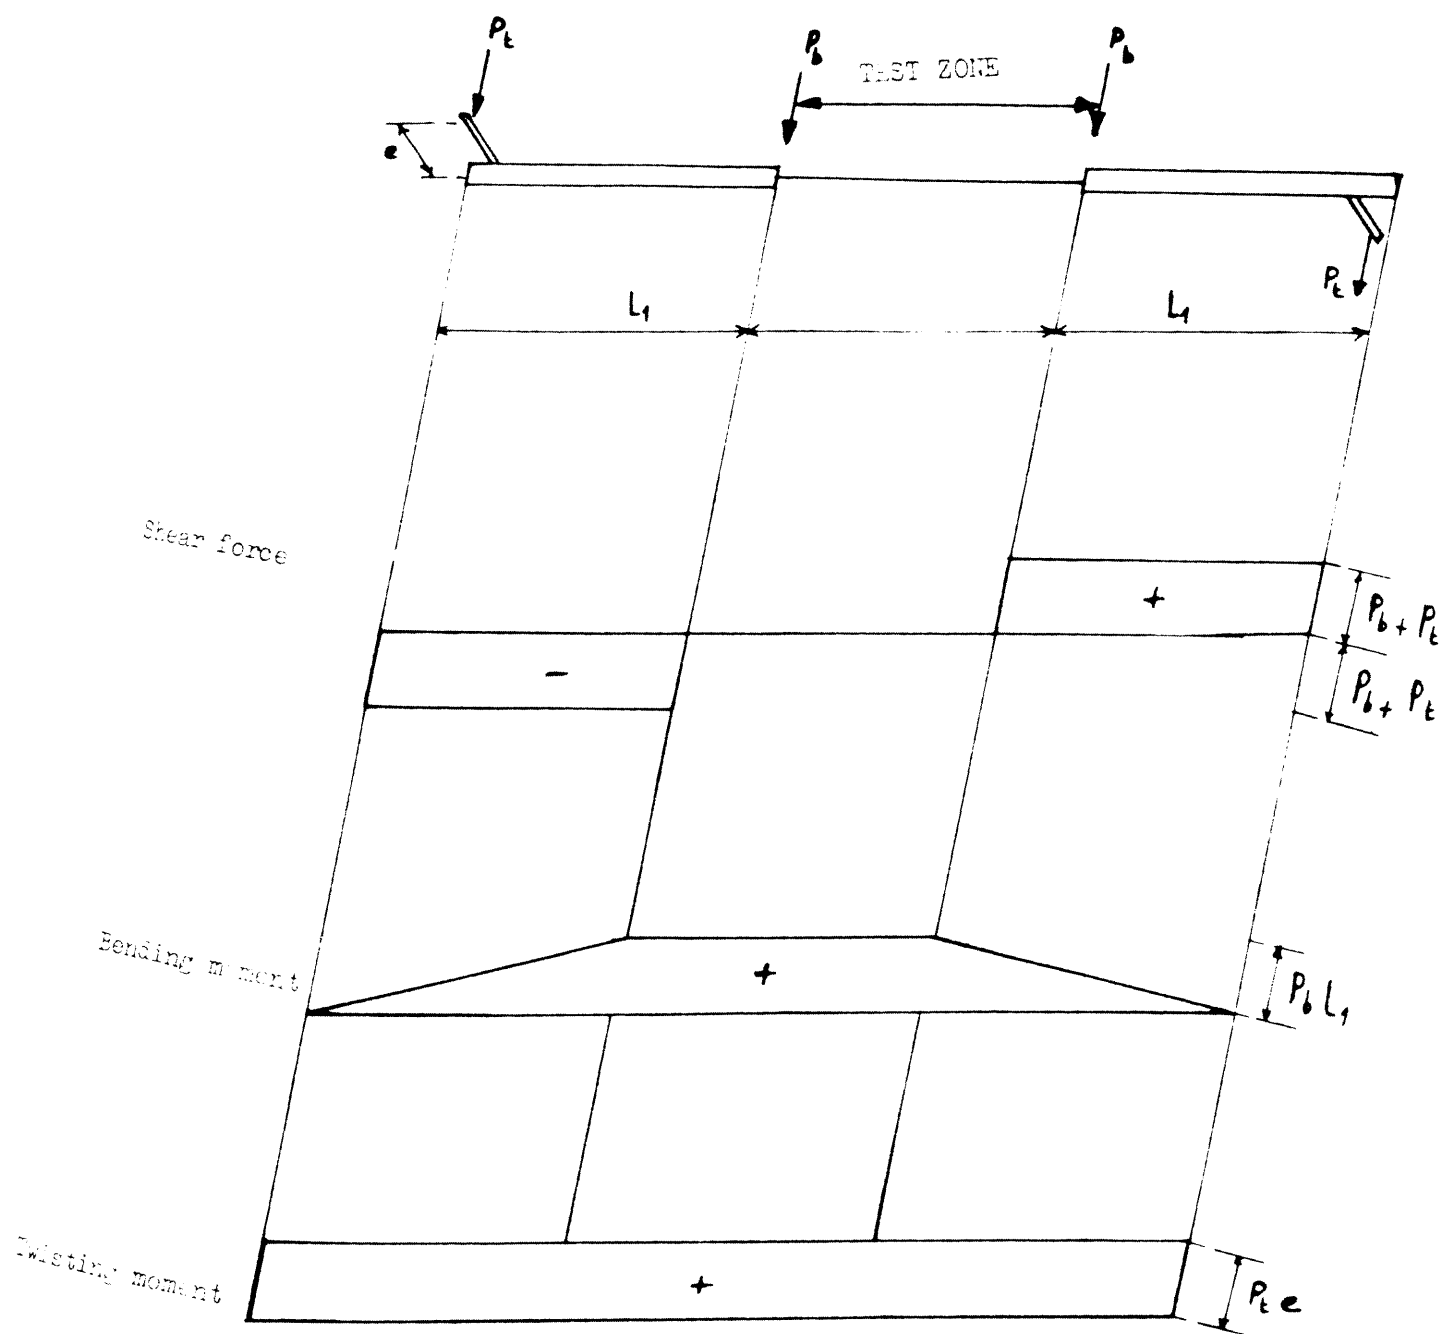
Loading arrangement for beams under Torsion and Bending
